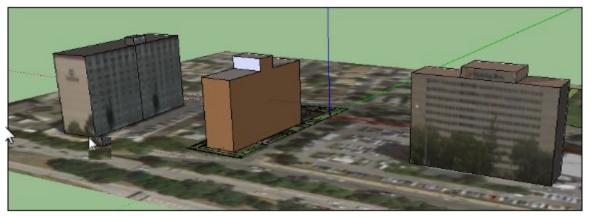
Proposed Project and Buildings of Similar Height - Perspective View
